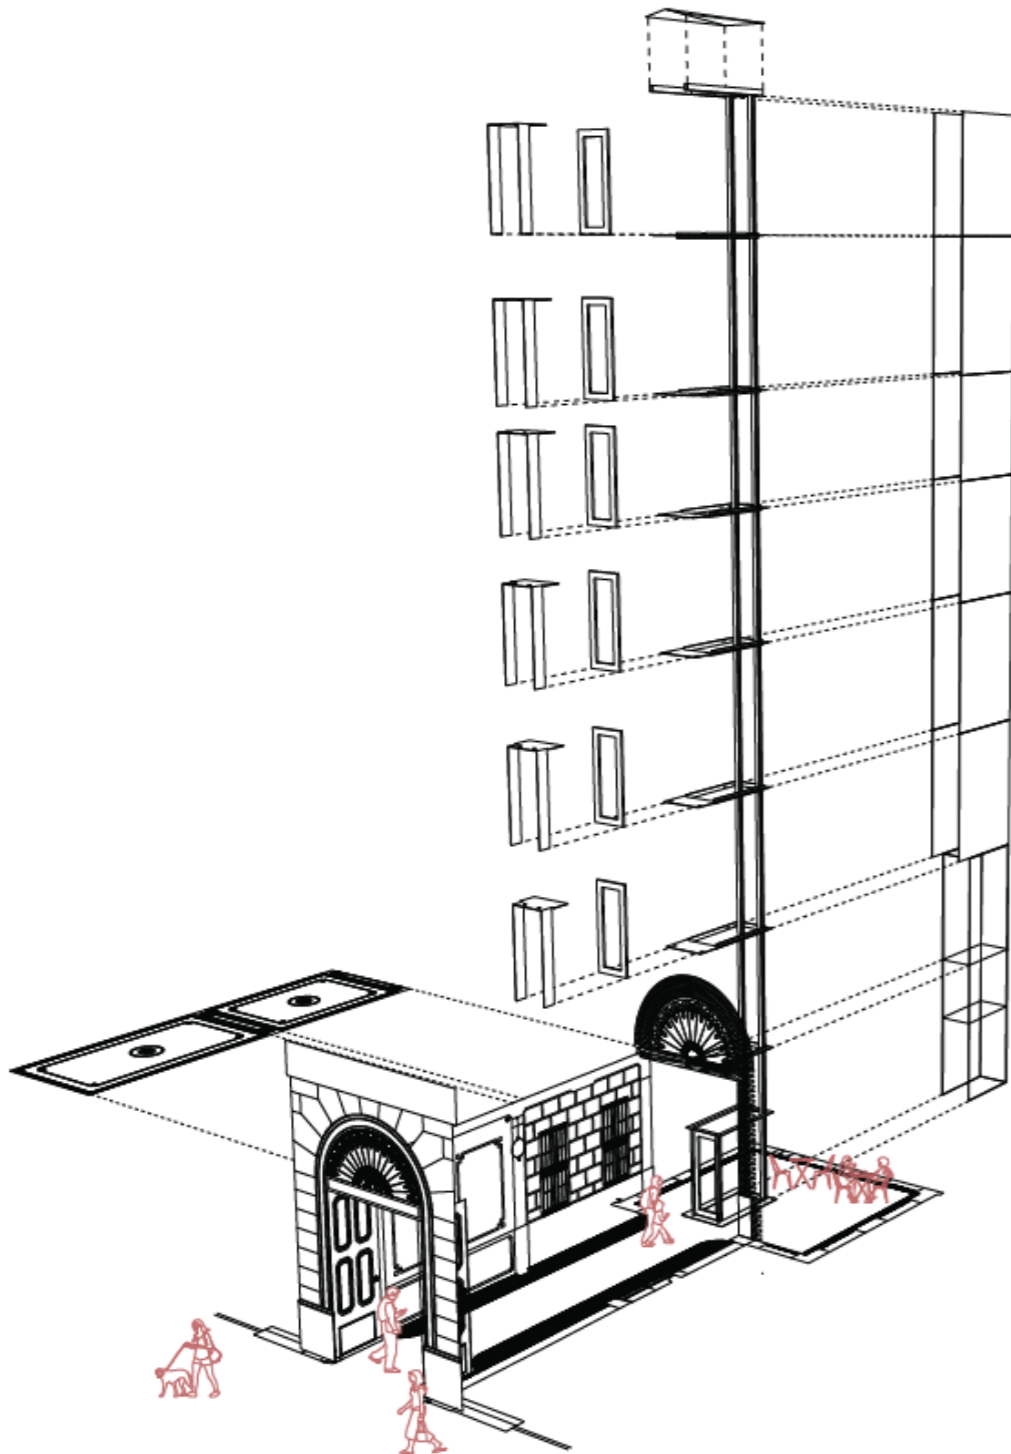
Axonometric diagram of the new elevator structure and connection with the existing building.
